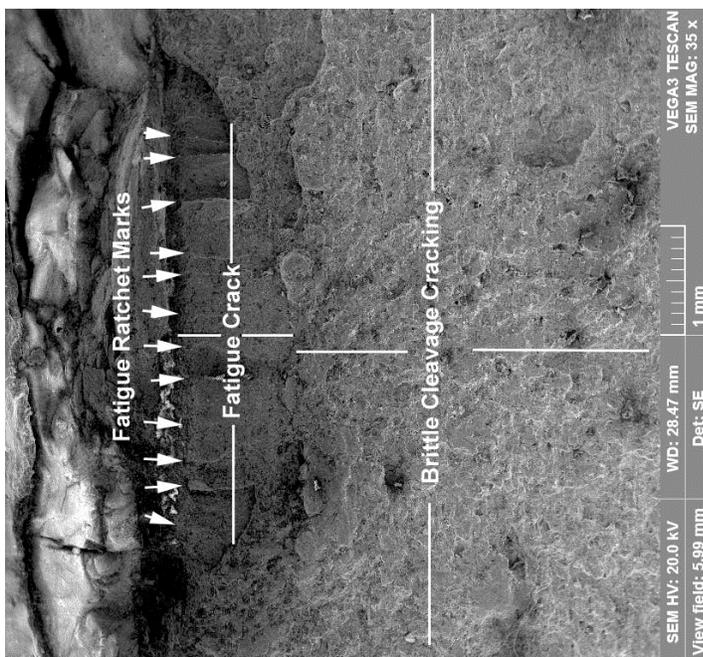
Fracture in interior girder of the northbound I-75 bridge over Lynn Camp Creek in Whitley County (2014).
